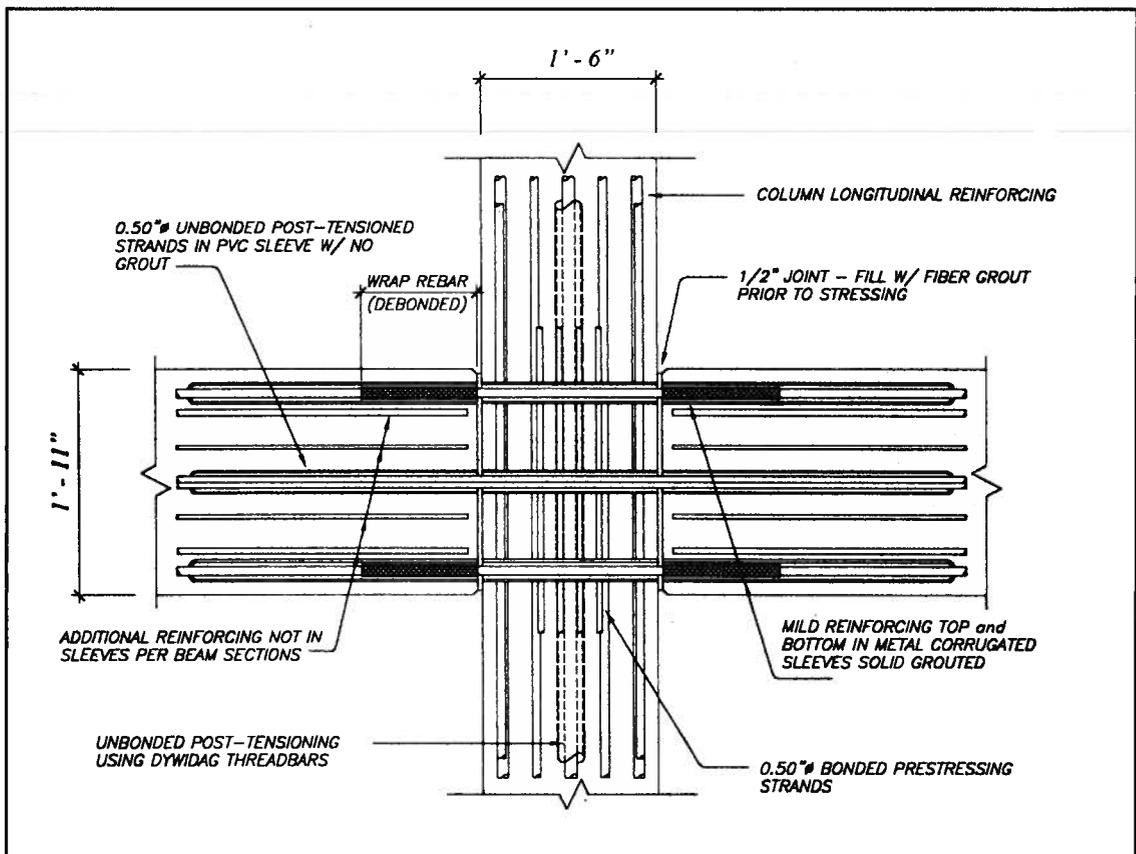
Idealization of interior column hybrid connection used in the PRESS Test Building (transverse joint reinforcement not shown for clarity only).
